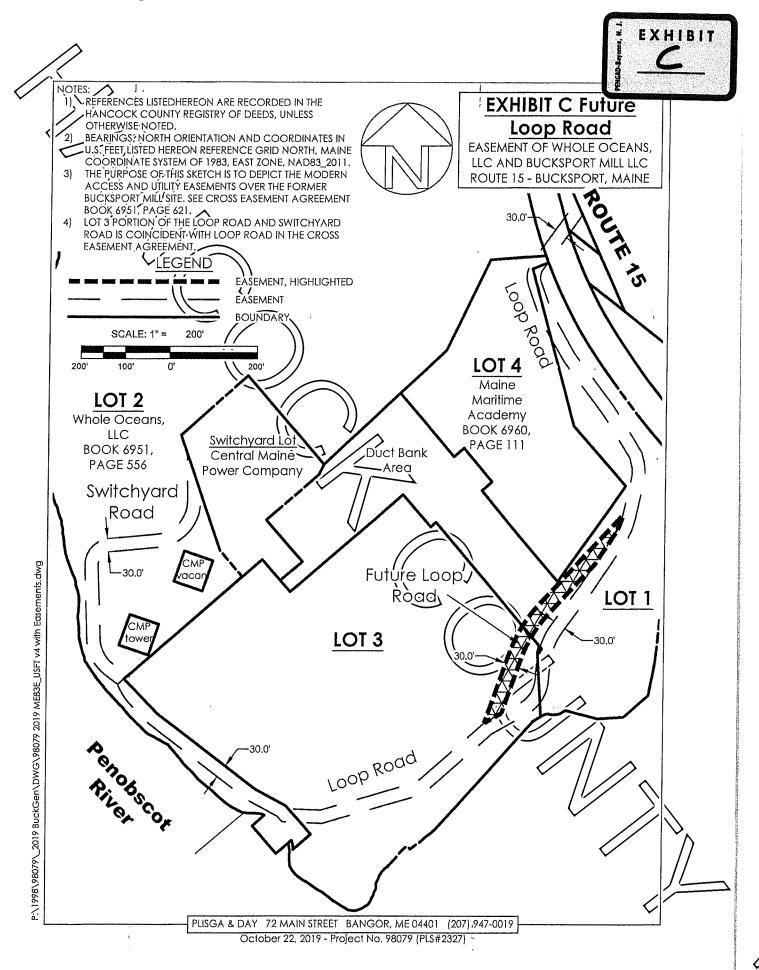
EXHIBIT C PLAN OF LOOP ROAD RELOCATION
